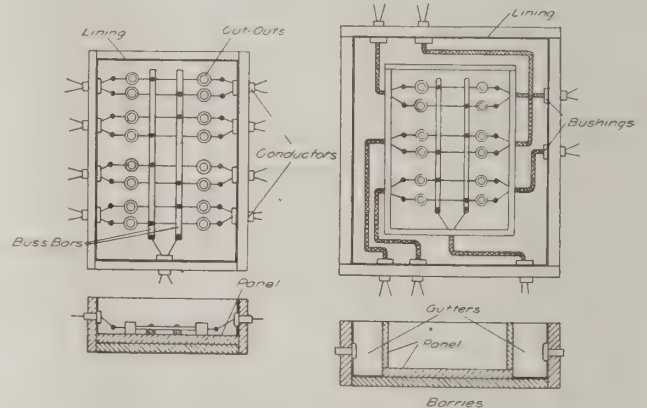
PANEL BOX WITHOUT GUTTER. FIG. 3. PANEL BOX WITH GUTTER.
